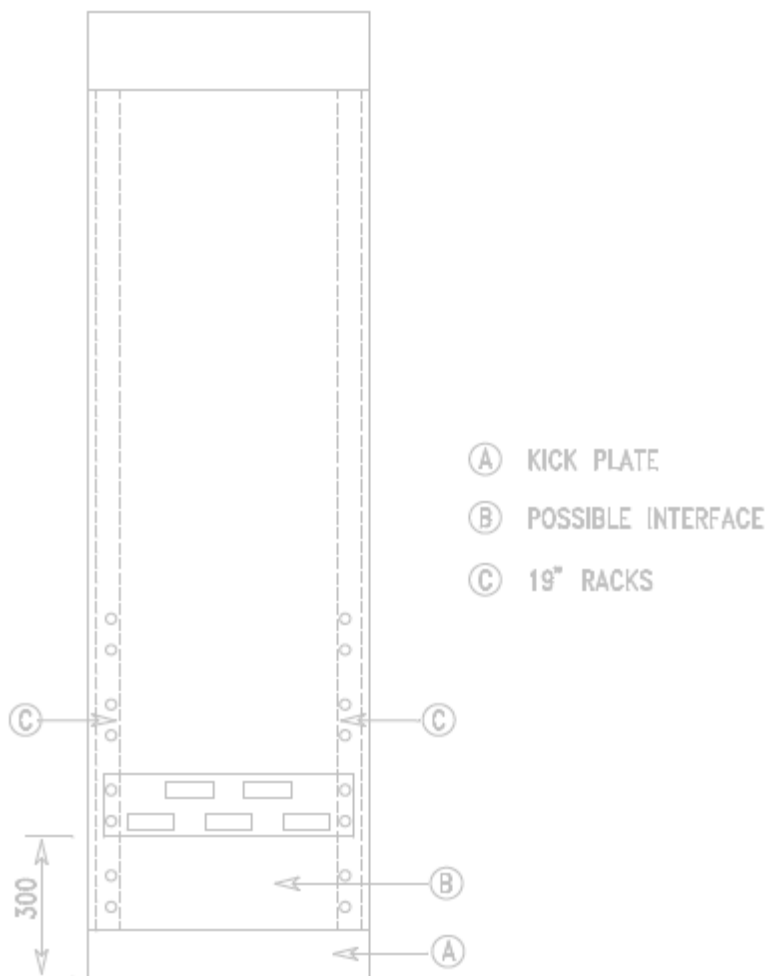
19 inch Rack panel (483 mm) - recommended location and layout of test blocks
